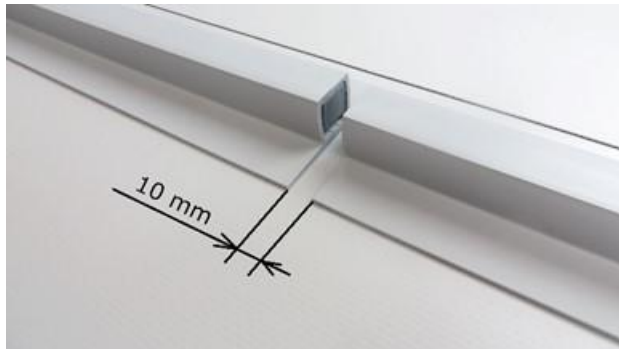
Expansion gap between profiles oriented along the slope of the roof
